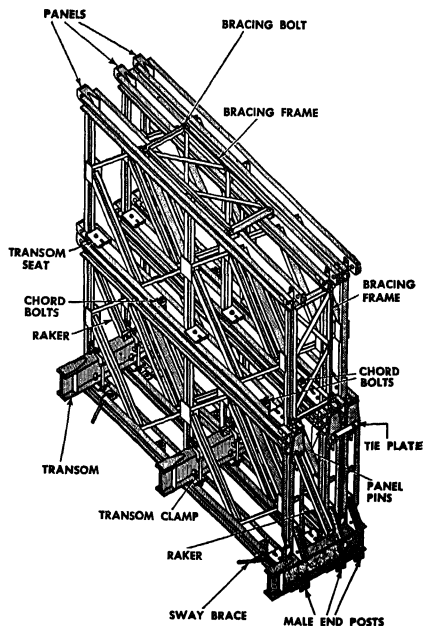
Location of bridge parts in trusses of triple-double bridge.
